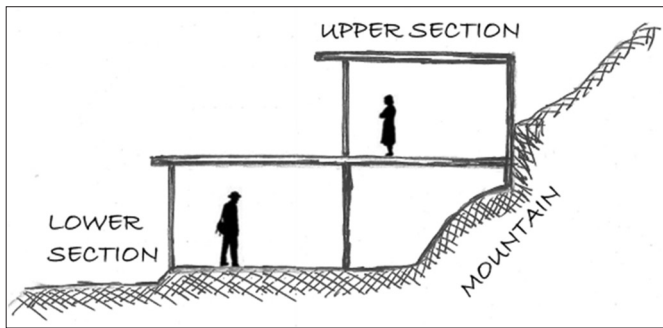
Sketch showing the positions of the lower and upper sections of the visited house in the town of Tewelle. (Author, 2014)
